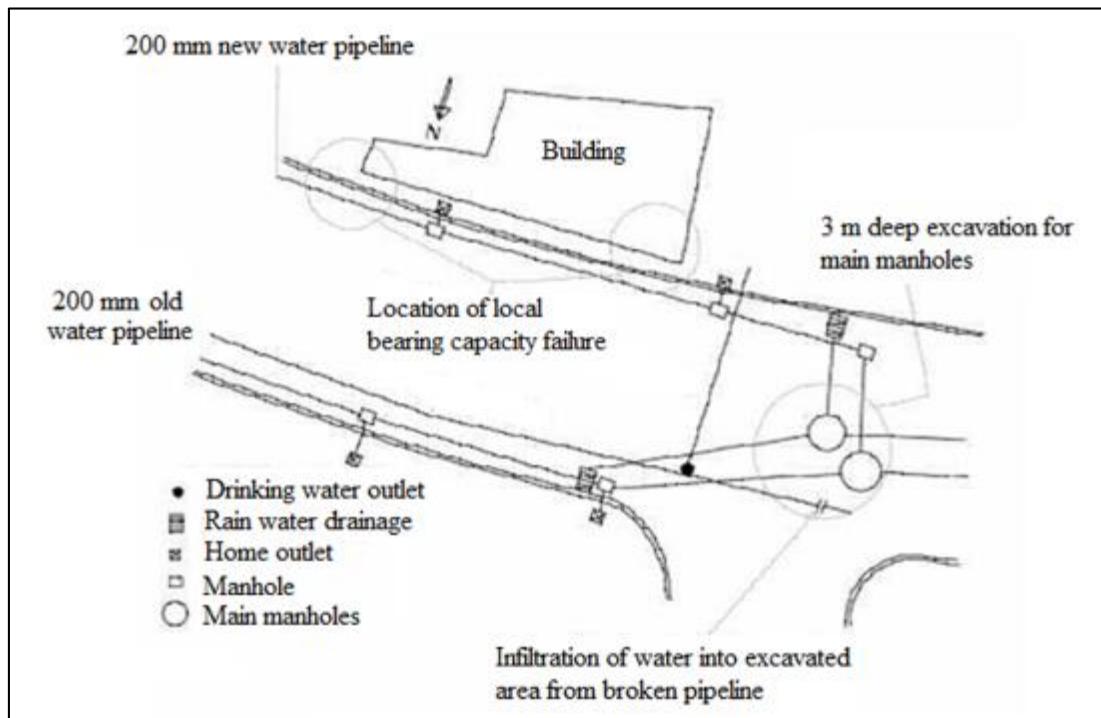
Location of building, the excavation for infrastructure and broken old pipeline
